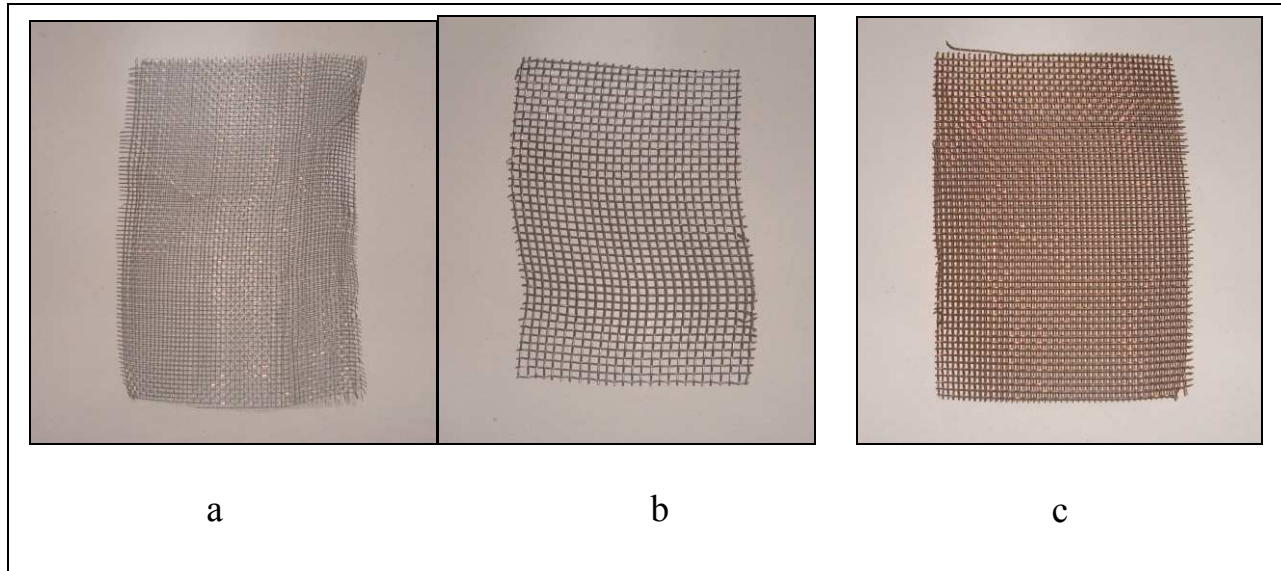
Types of used wire mesh: (a) galvanized Brass wire mesh with 1mm diameter. (b) Galvanized Steel wire mesh with 1mm diameter. (c) Galvanized steel wire mesh with 0.25mm diameter
